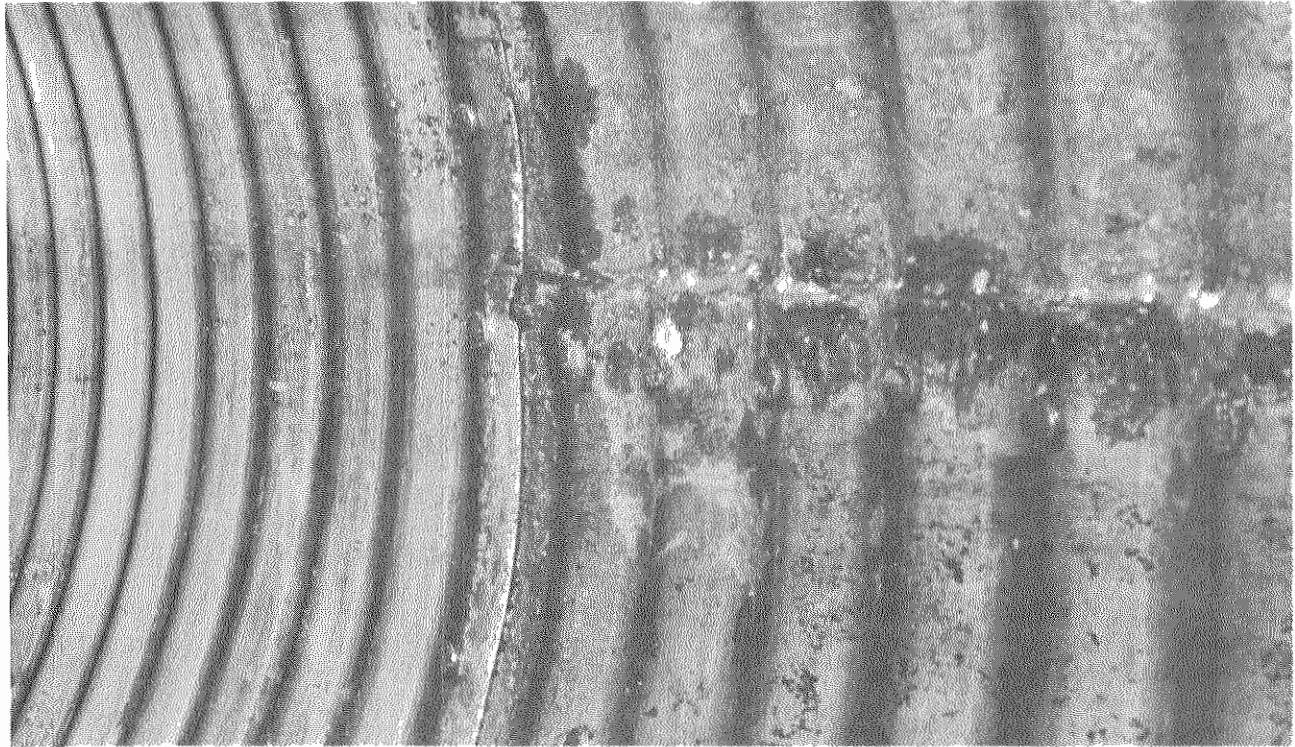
Lines of "white rust" spots along riveted joint in a US2 galvanized steel culvert (north end, Sta. 549+50).
